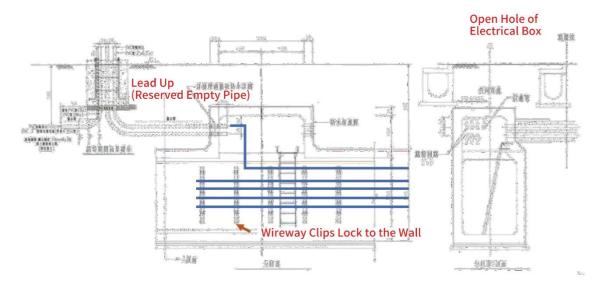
Example of Actual Construction Drawing of Common Pipeline and Division
